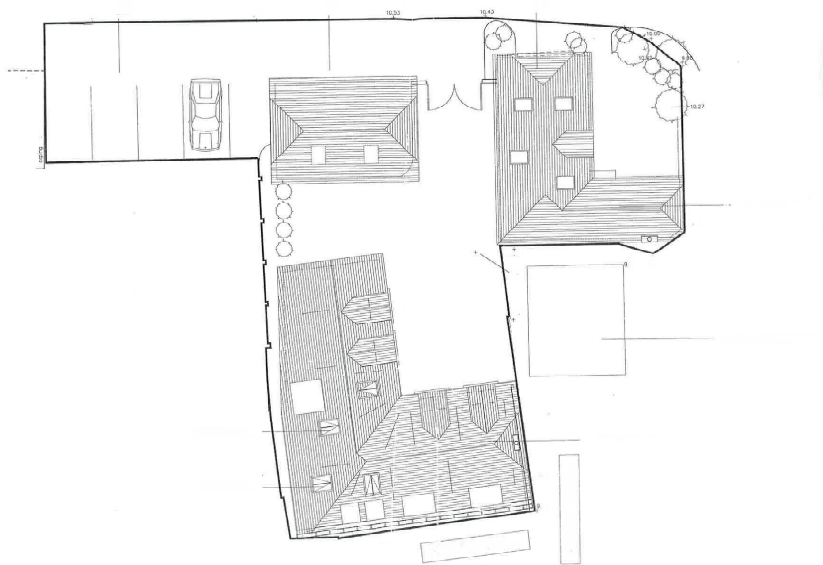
Layout of the scheme (two dwellings and garages) approved at the site
